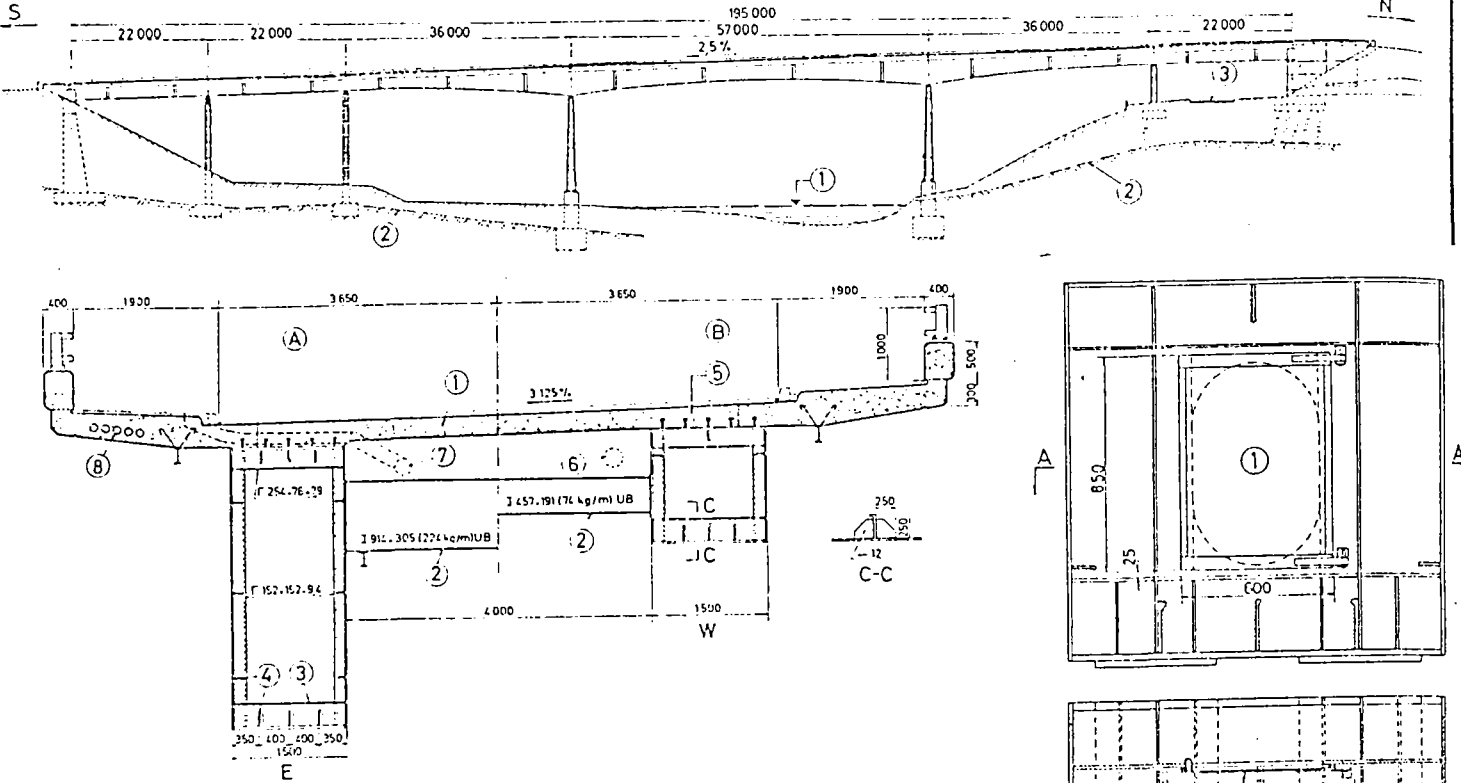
Cross section. (A) Through the central span, near the main piers (maximum depth). (B) Through an approach span (minimum depth). (1) Reinforced concrete slab. (2) Cross beam. (3) Transverse stiffener (305 x 76 x 7.9 angle, formed of 2 welded plates). (4) Longitudinal stiffeners (bulb flats). (5) Hot rolled asphalt. (6) Water pipe. (7) Drainage pipe ϕ 200 mm. (8) G.P.O. ducts.
